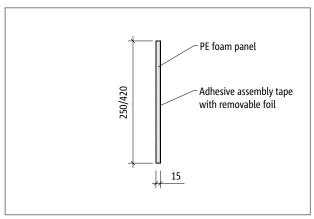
Schöck Tronsole® type L-420: Element arrangement, Section A-A
